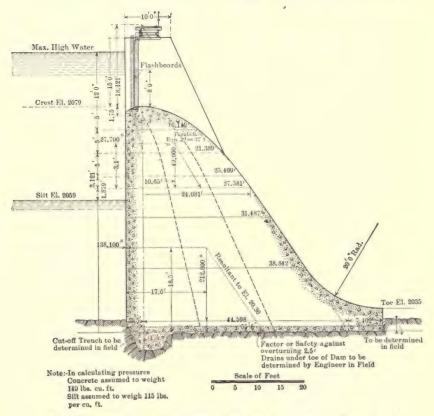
Cross-section of Masonry Gravity Dam Shown in Fig. 36.
